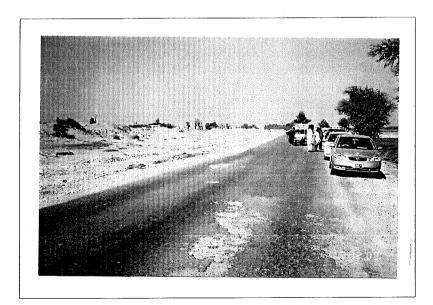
No sign of TST layer. Poor drainage conditions are also visible.
